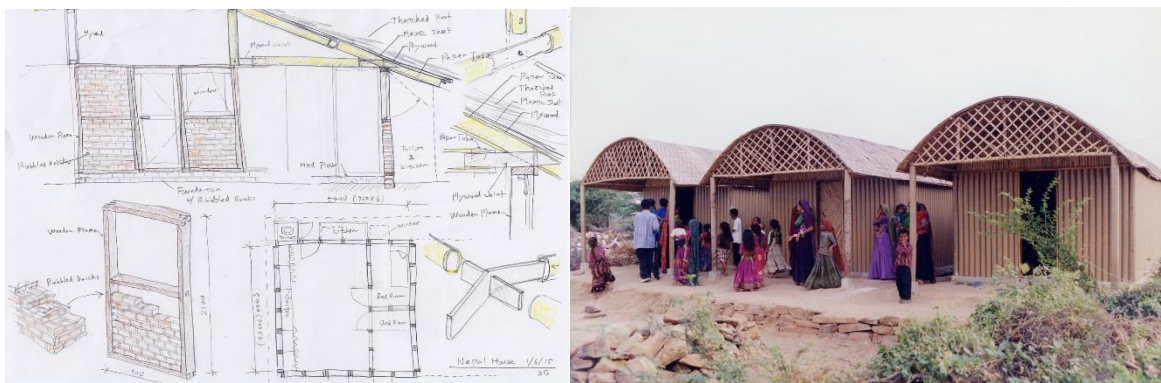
Structures made of cardboard pipes and fragments of destroyed buildings [5]
